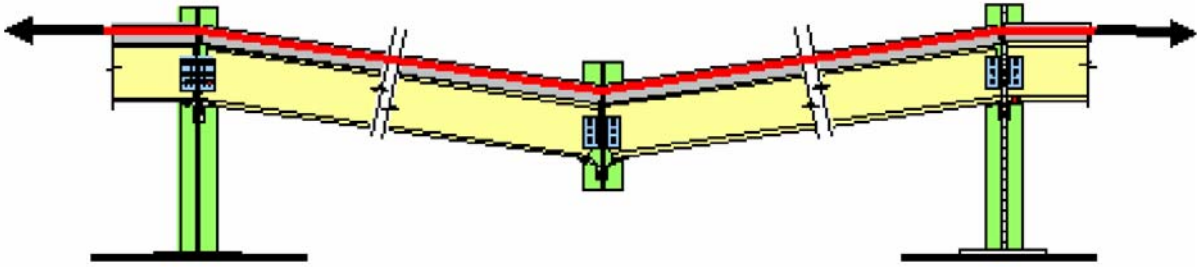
Catenary cables transferring load from a removed column to vicinity members, Astaneh (2003)
